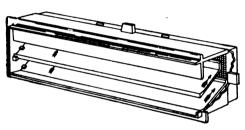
Wall Box with Louvre Slats and Netting, Direct-Indirect System.
